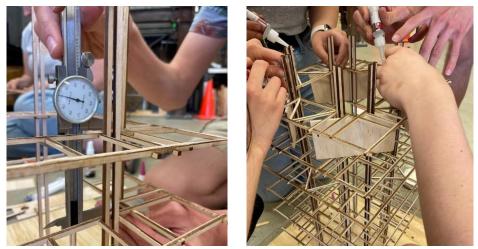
(a) Floor to Floor Height (b) Gluing Diaphragm to Column Bundles
